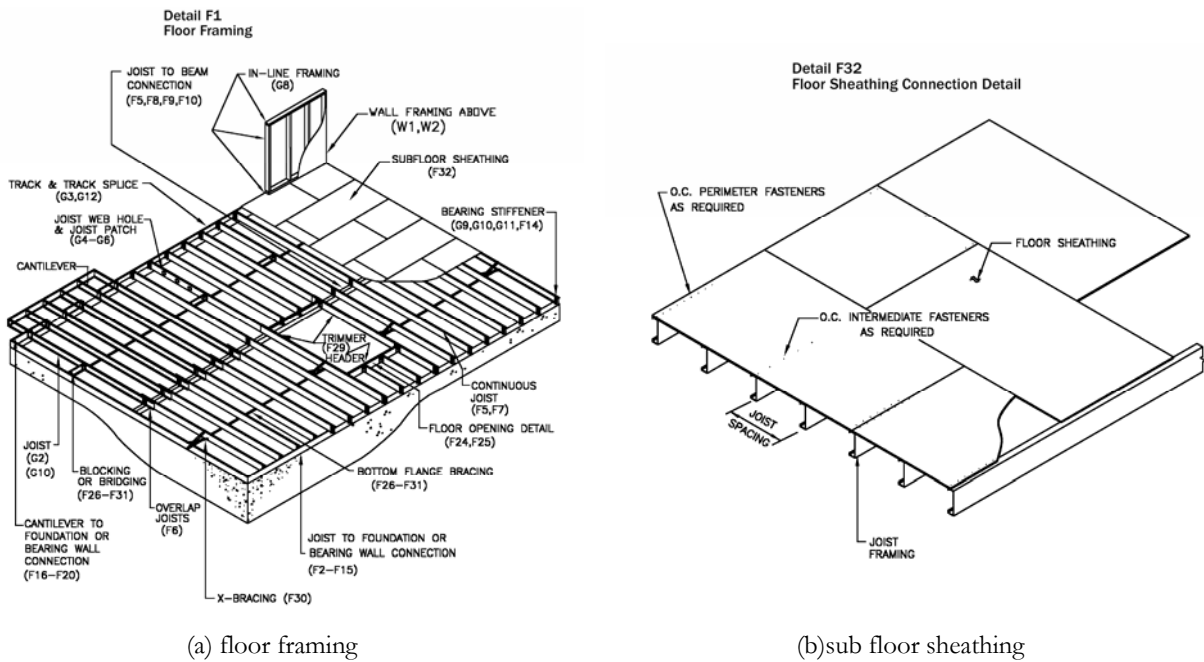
Typical floor framing showing (a) overall floor system including blocking/bridging to stabilize joists and (b) sheathing of joists
